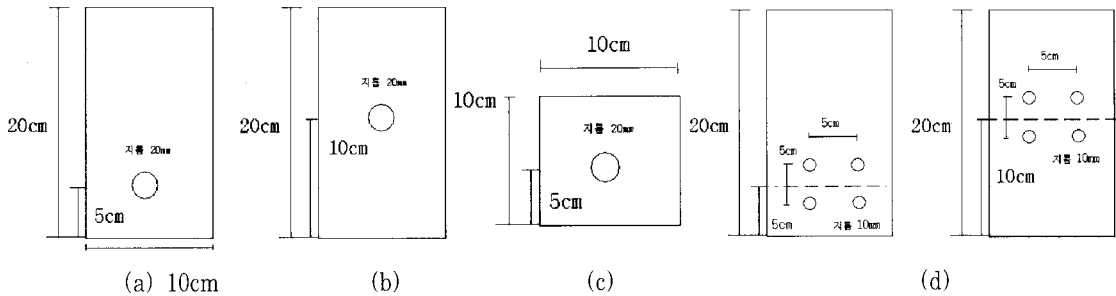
The location of bolt holes for main member and side member; (a) main member, (b) side member, (c) inserted material(plywood, rubber plate), (d) small diameter specimen.
